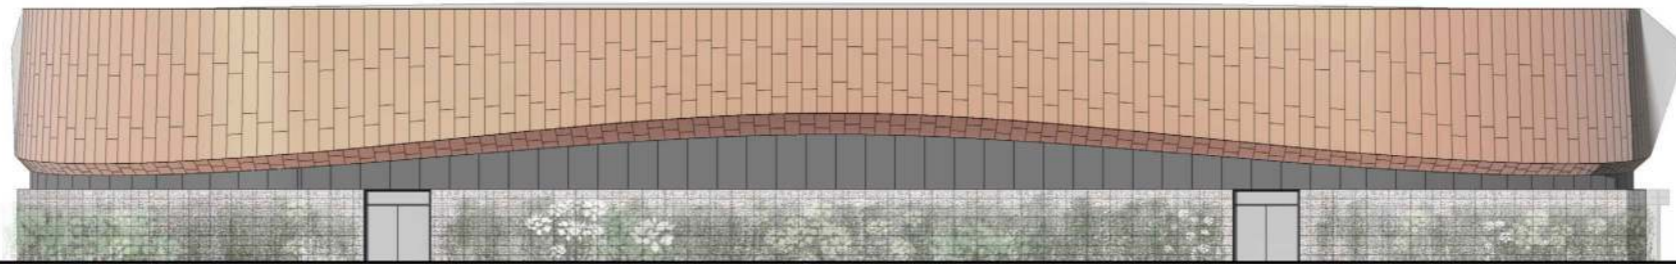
Illustrative elevation - north west elevation facing Leyton Marshes
